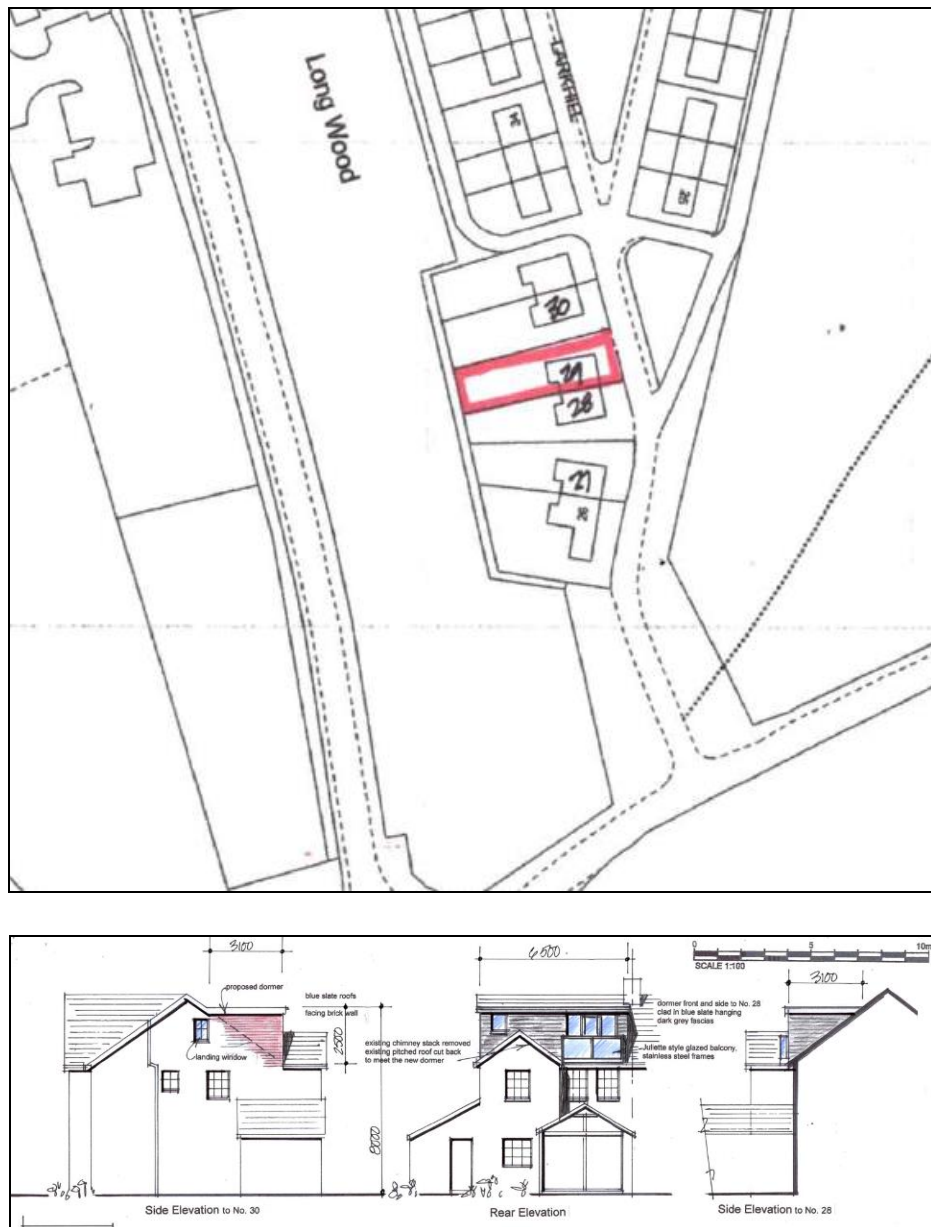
Location plan (top) and proposed elevations (bottom) (©David Liversidge)
